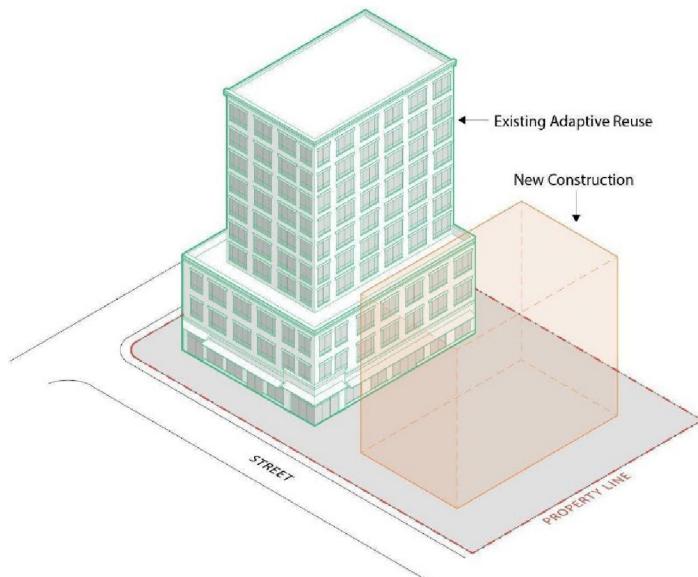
X.1.(c)(2)(i): Example of Unified Adaptive Reuse with New Construction on the Same Lot
